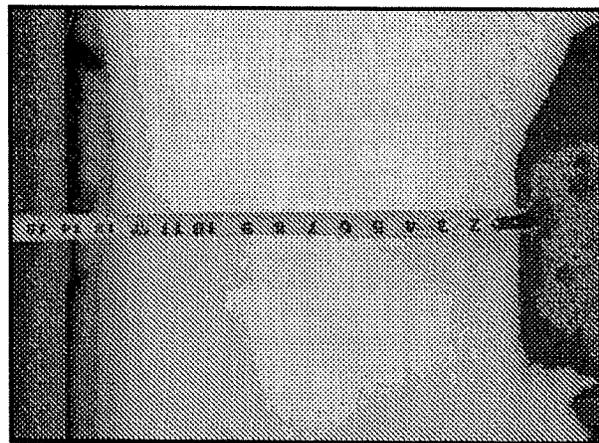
Space between shotcrete wall and back of cap unit approximately 15 inches
